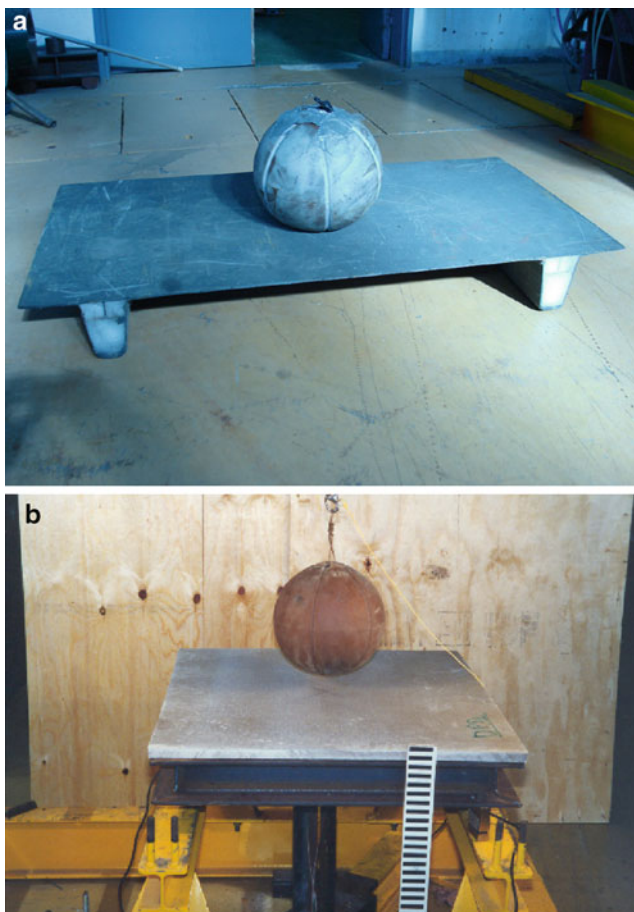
Initial test fixtures, no instrumentation (a) initial test set-up, (b) panel simply supported on steel frame
